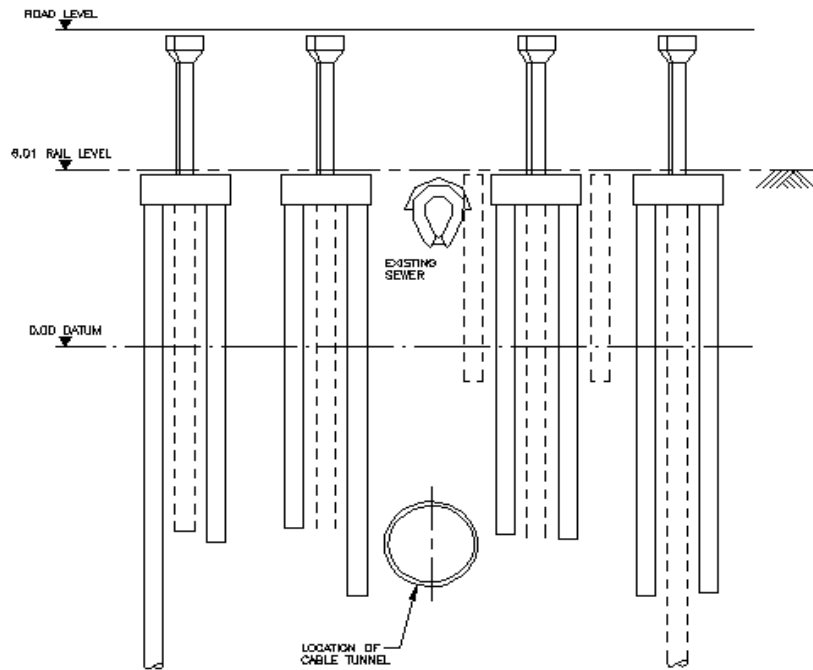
Tunnelling beneath piled railway sidings at Charterhouse Street
